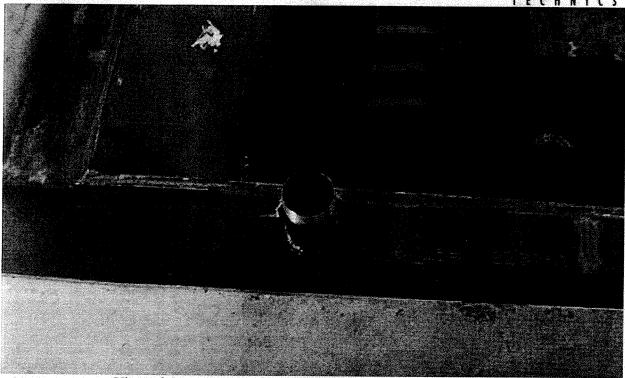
View of the 4-inch diameter access port that allows inspection of the secondary containment. Note the perimeter plates are not yet installed.
